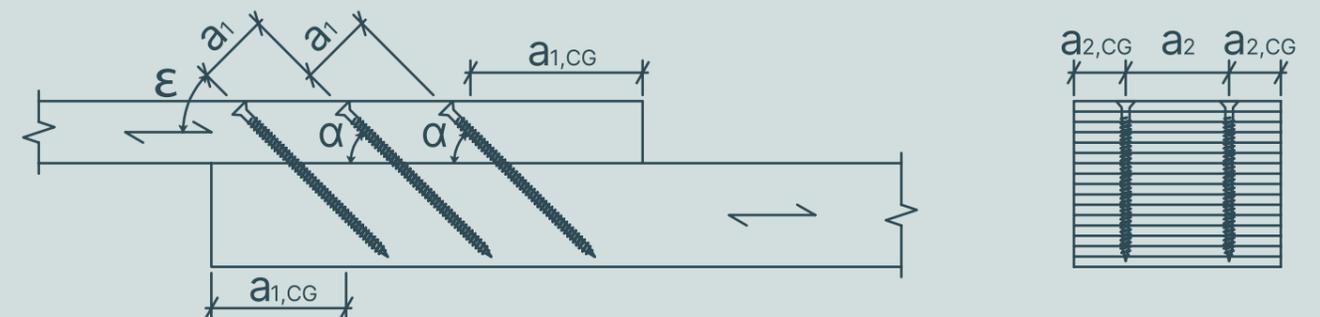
Spacings between fasteners and end and edge distances when the connecting members are loaded with axial load
